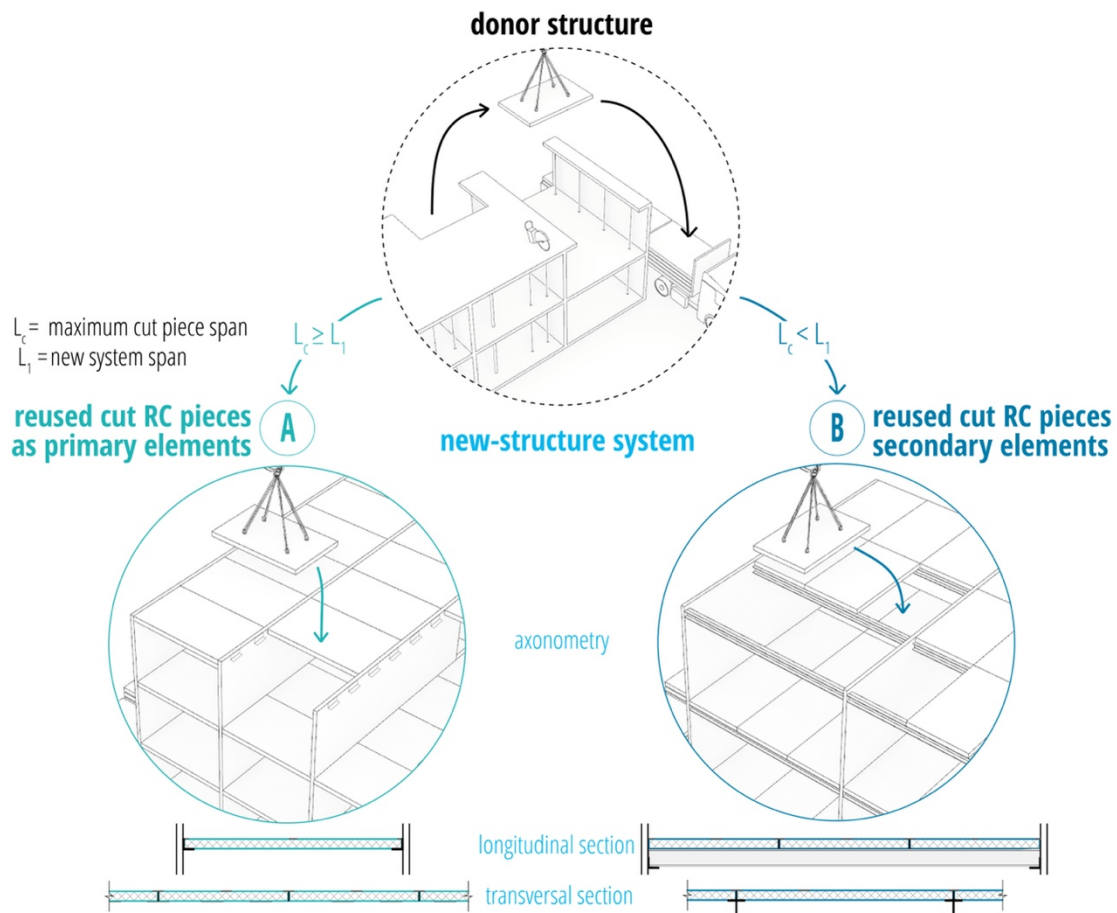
Concept of the reused-RC floor systems: pieces are cut with saws from buildings undergoing transformation or demolition and reused over the longest span that static allows as primary (A) or secondary (B) elements in the new floors.
